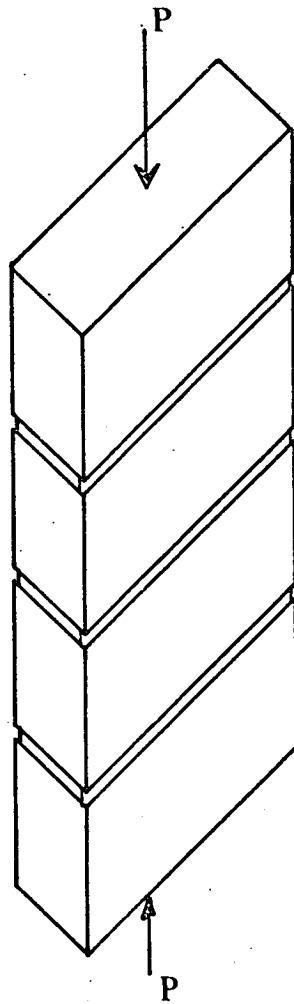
a Concrete Blockwork Prism under Axial Load.
